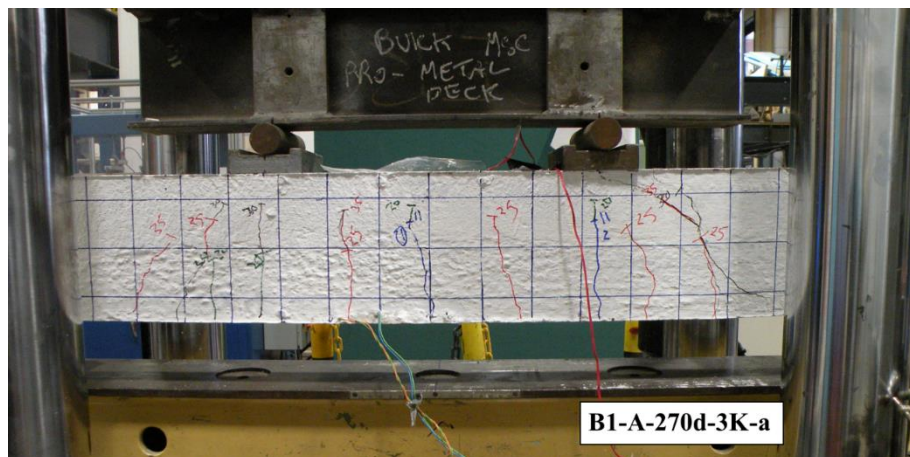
Crack pattern and failure mode of beam1 loaded and stored in lab.
